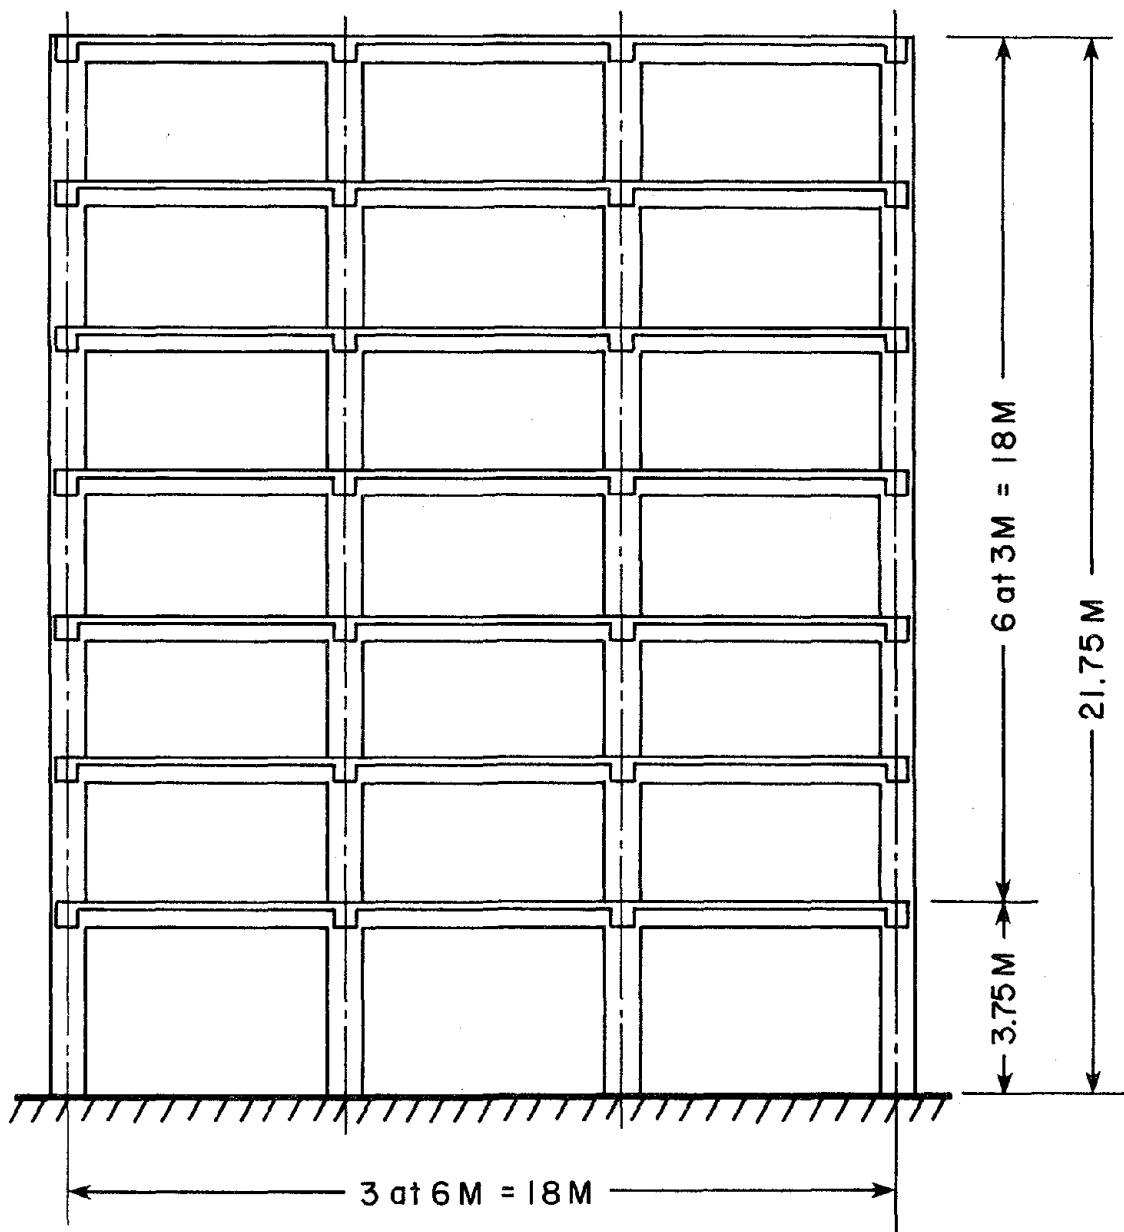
Elevation View of Reinforced Concrete Test Structure
